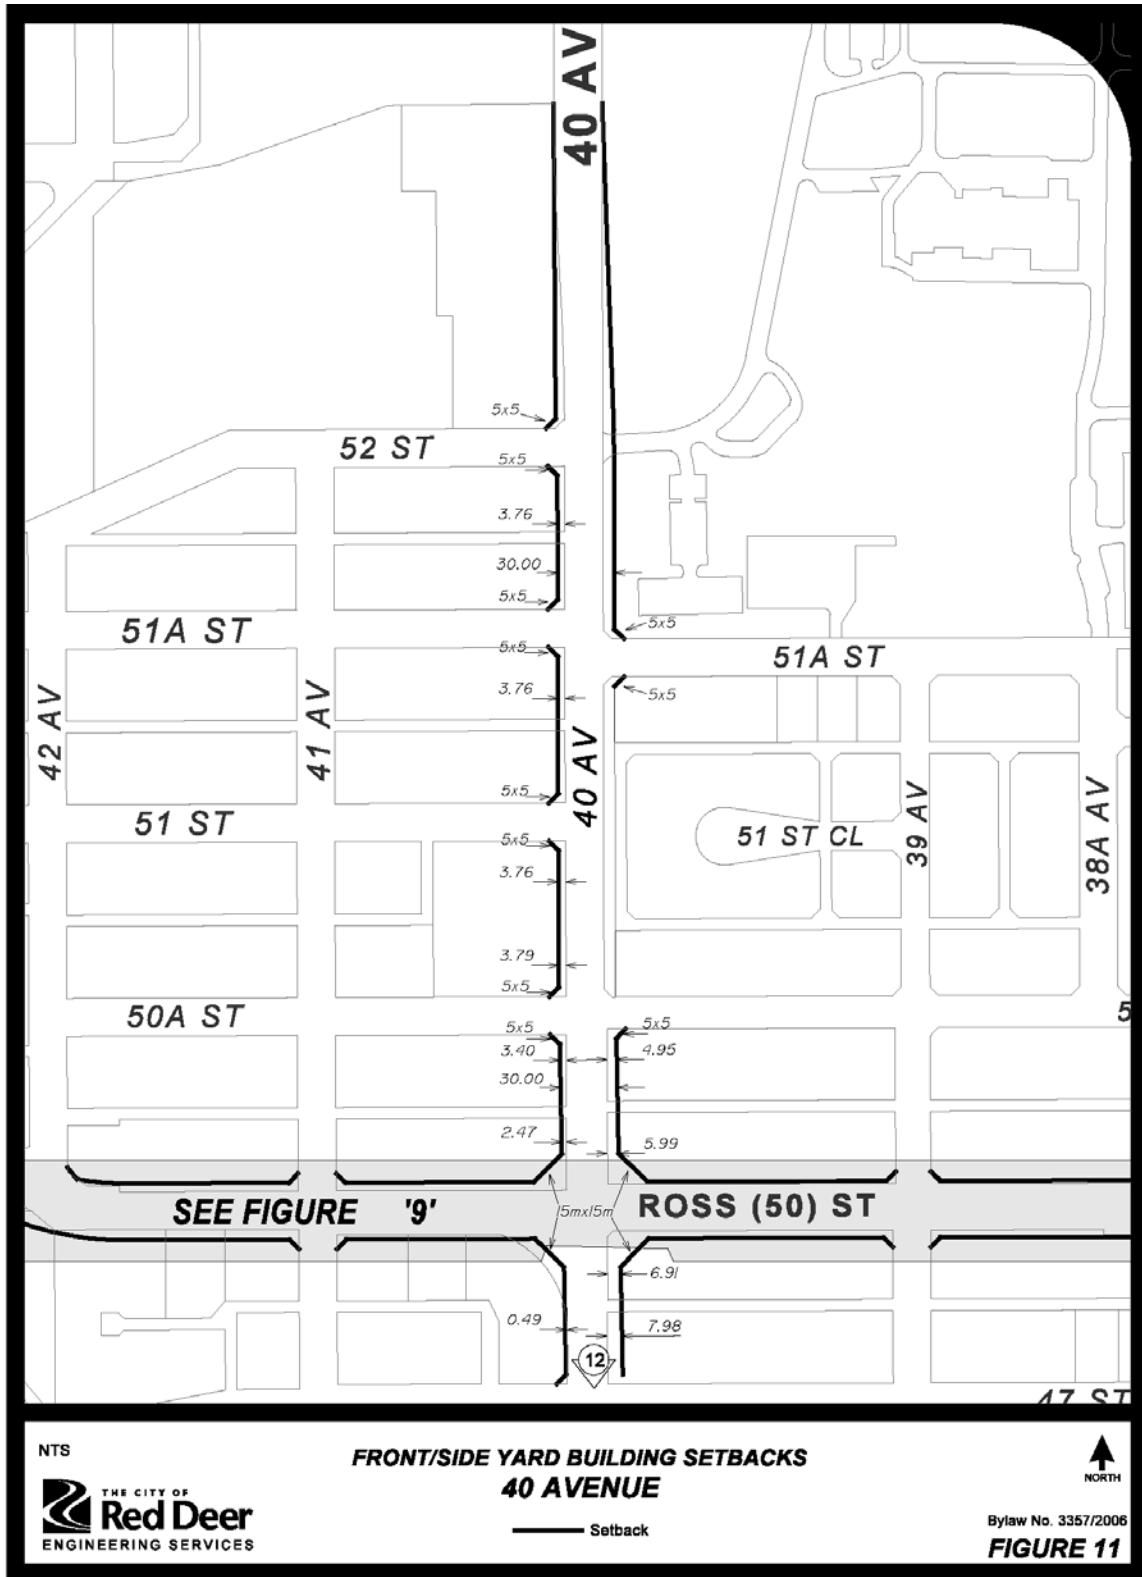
Front/Side Yard Building Setbacks 40 Avenue
